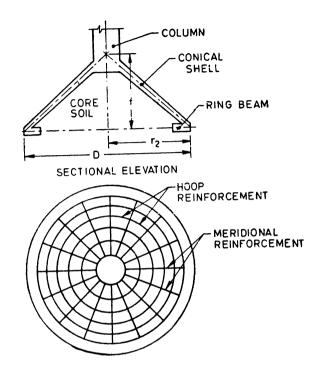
PLAN SHOWING REINFORCEMENT OF CONICAL FOOTING
